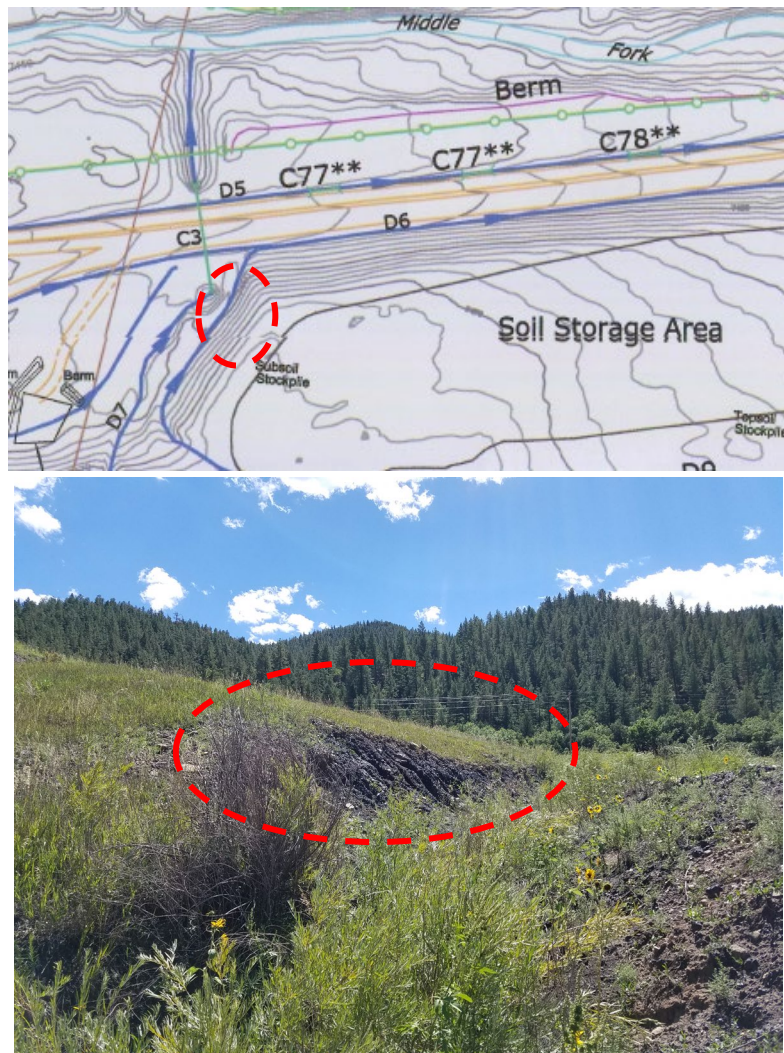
Soil Storage Area embankment on the west side. Slope failure highlighted above.
